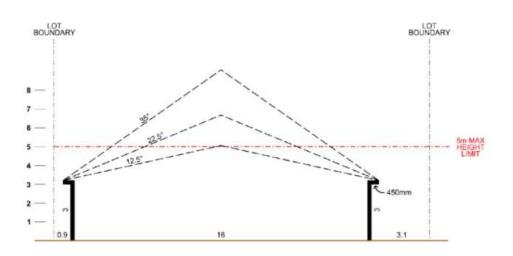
Five (5) metre maximum building height limit compared to roof pitches.
